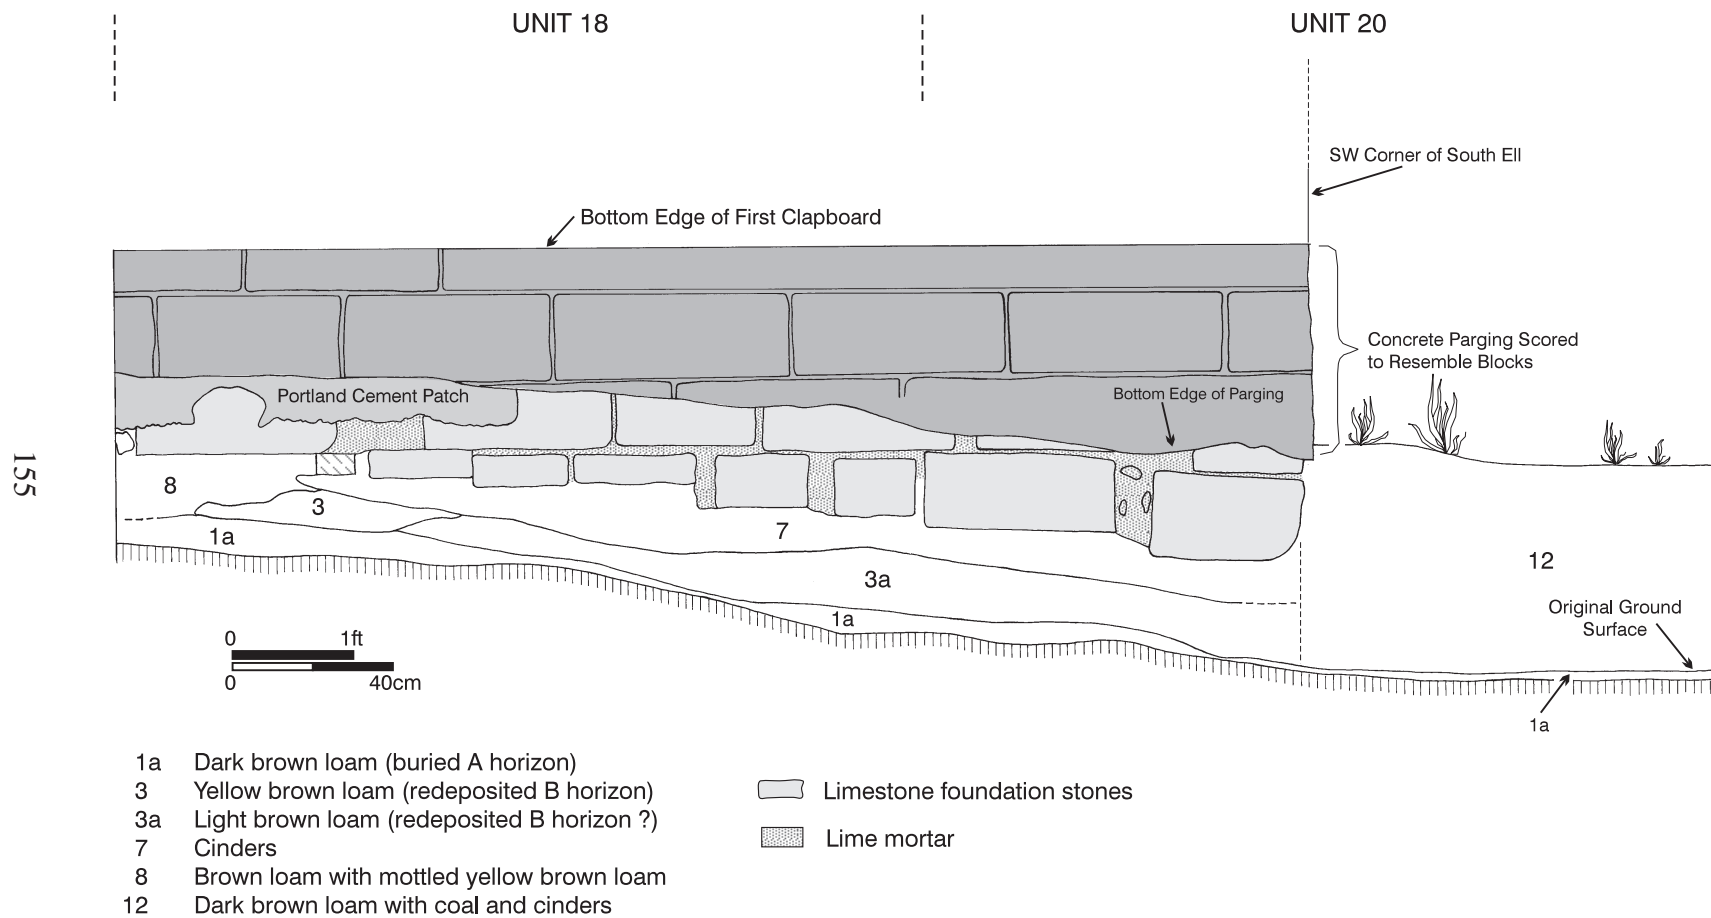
Profile, west wall of south ell, HS 10 (Units 18 and 20).
